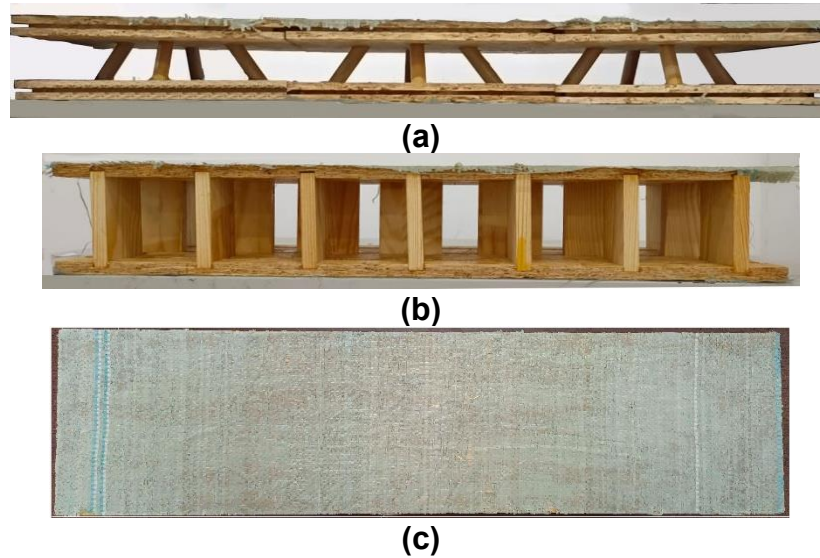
Specimens of panel reinforced sandwich structure plate member. (a) Pyramid sandwich structure plate member; (b) Grid sandwich structure plate member; (c) Vertical view of the specimen
